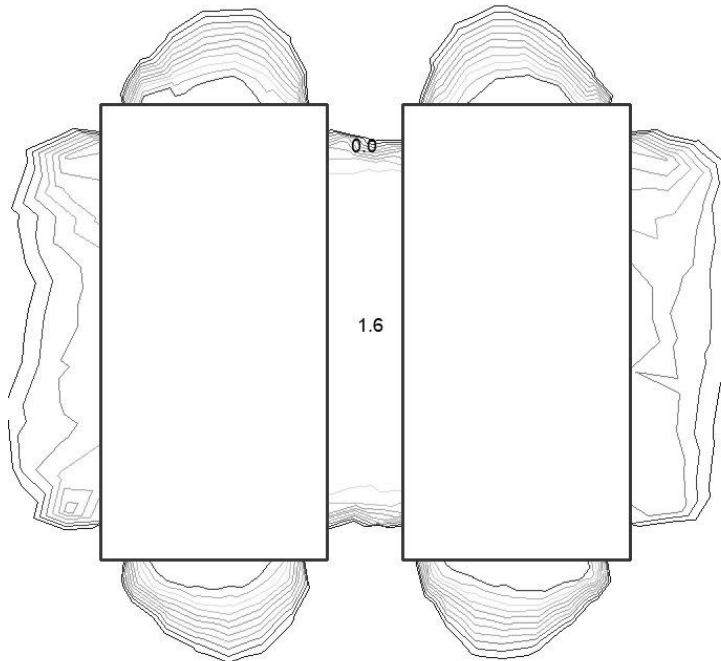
Tensile zones around two parallel excavations 9 m wide, 18 m high, at a distance of 3 m
